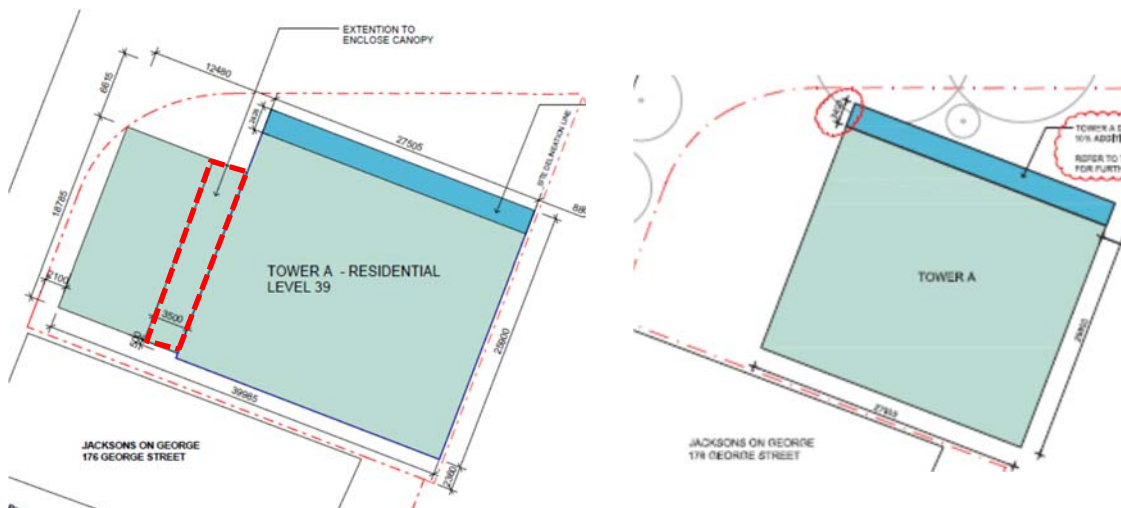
View of proposed awning extension (l) and approved building envelope (r) at L39
